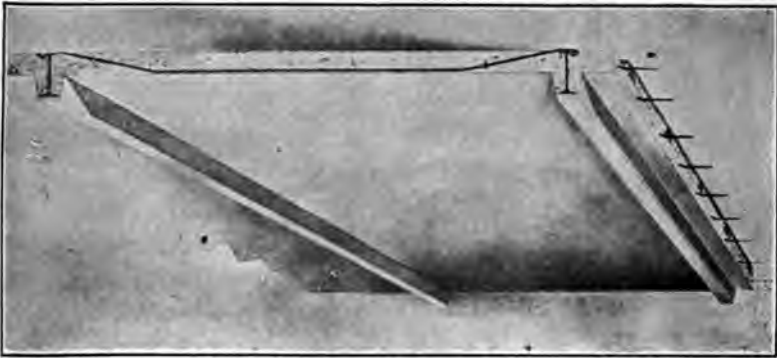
Slab Floor Reinforced with Corrugated Bars.
